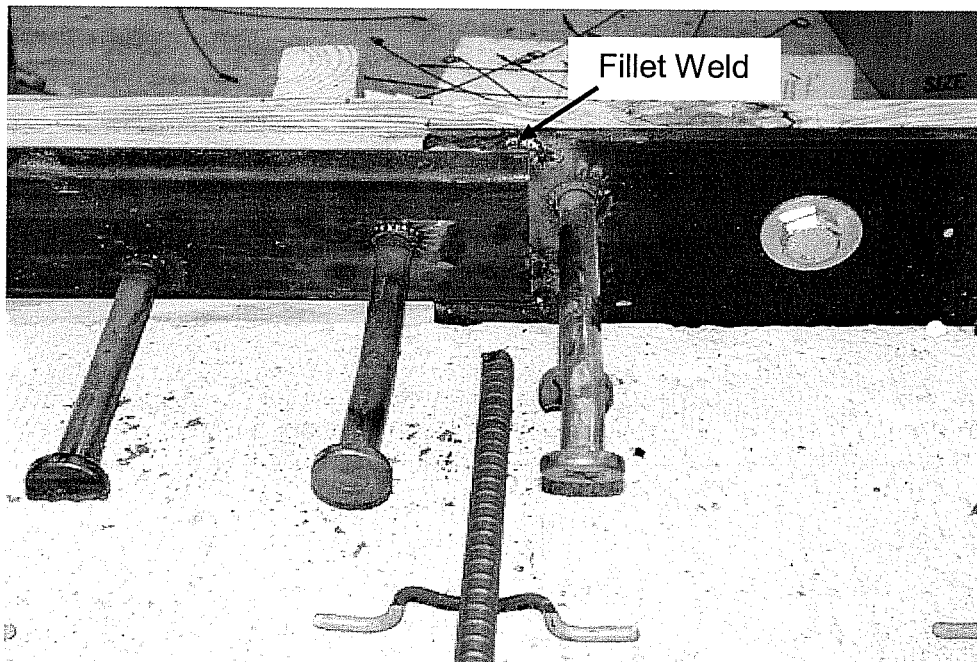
Weld splice between sealed expansion and armor joint rails
